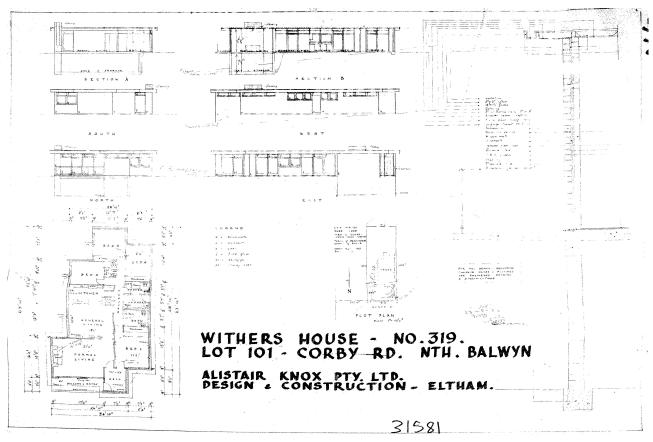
Undated working drawings for revised scheme with sub-floor garage source: City of Camberwell Building Permit No 31,581, copy held by City of Boroondara
